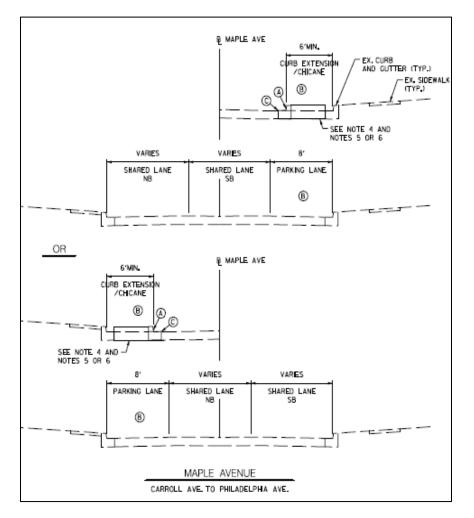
Typical Section - Carroll Avenue to Philadelphia Avenue
